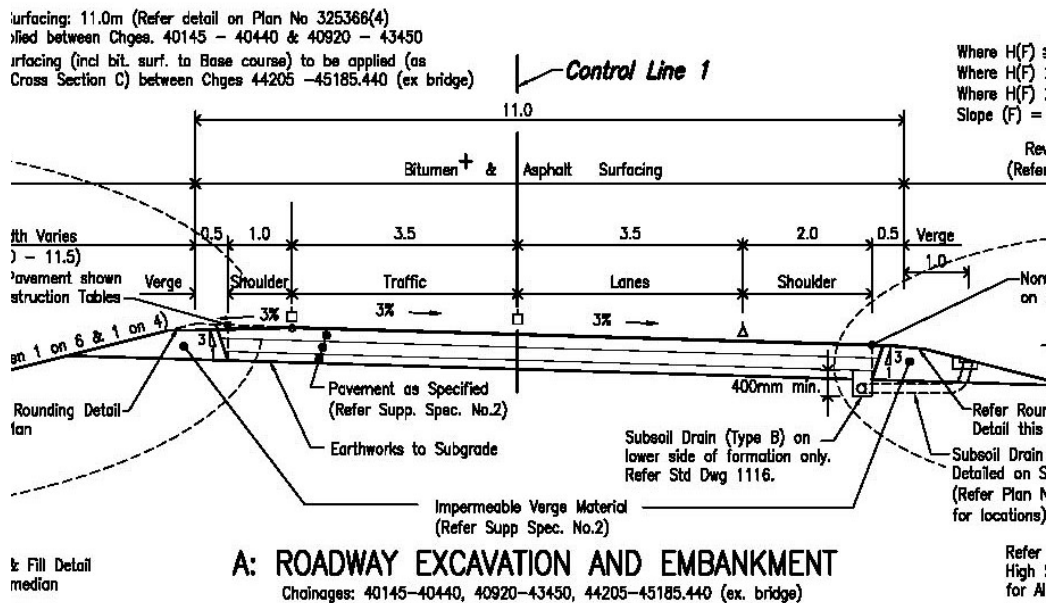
Extracts showing typical pavement cross-sections for the Gattton Bypass
